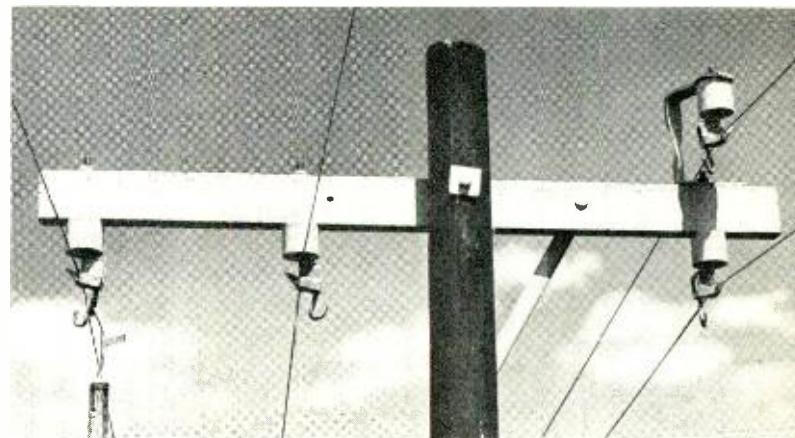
The wire-raising tool is here being used to tighten the locking screw of the insulated wire support.
